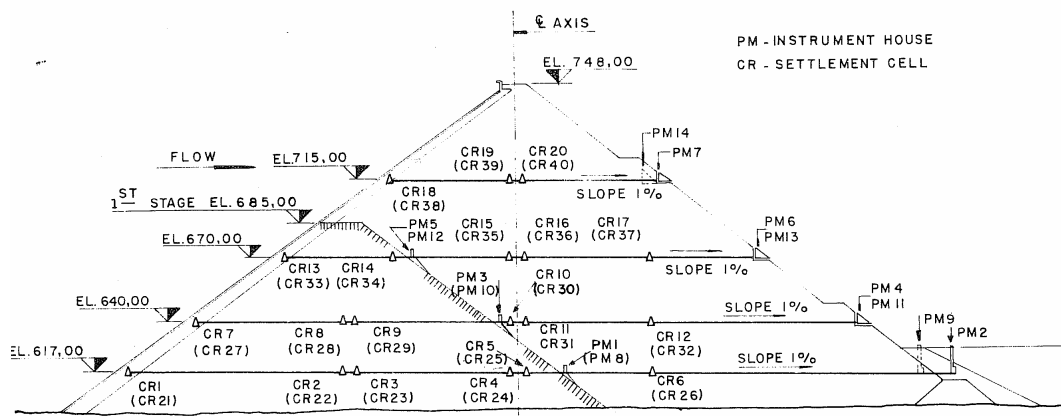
Dam Typical Section – Instrumentation within the rockfill maximum section
